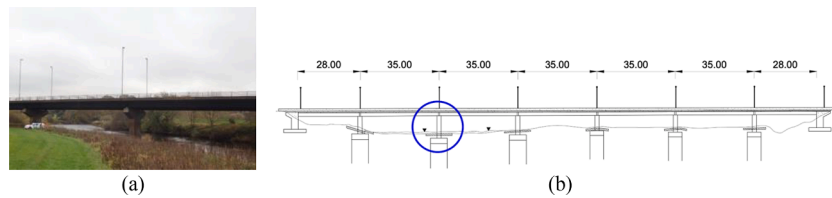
(a) A75 300 Dalscone bridge; and (b) bridge elevation.
